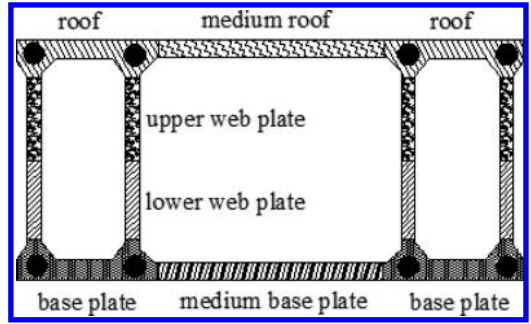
The outer wrapped concrete dividing ring of the arch rib.
